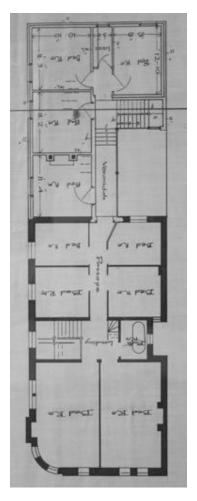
143–143a George Street, alterations undertaken in 1913, Second Floor Plan.
